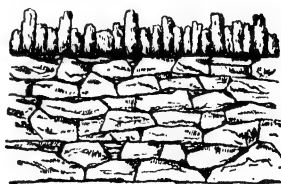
Random Rubble Walling with Rubble-on-edge Coping.
